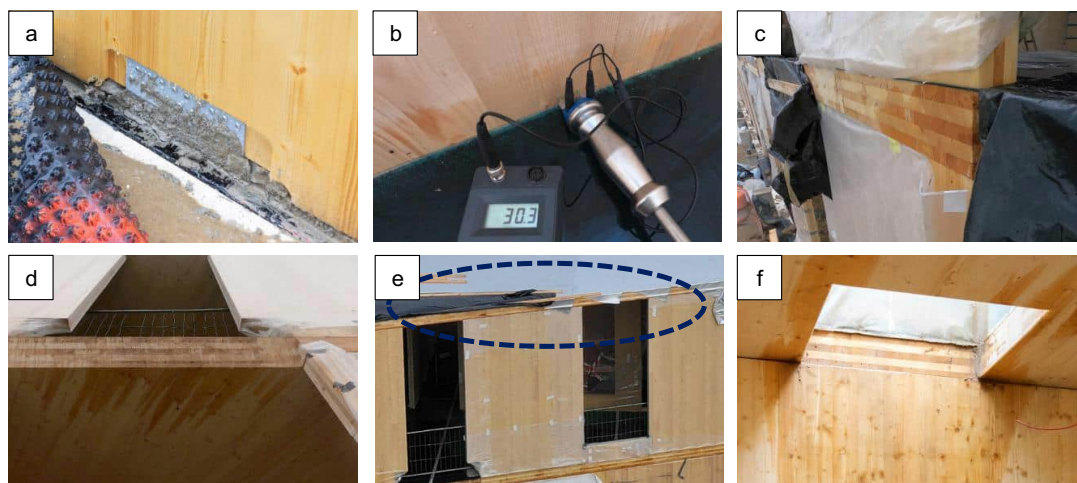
Photographs of CLT junctions where wetting occurred frequently during our observation: a) exterior wall to foundation connection; b) intermediate ceiling to intermediate wall connection; c) intermediate ceiling to external wall connection; d) intermediate ceiling to window connection; e) roof to exterior wall connection and f) roof to skylight shaft connection.
